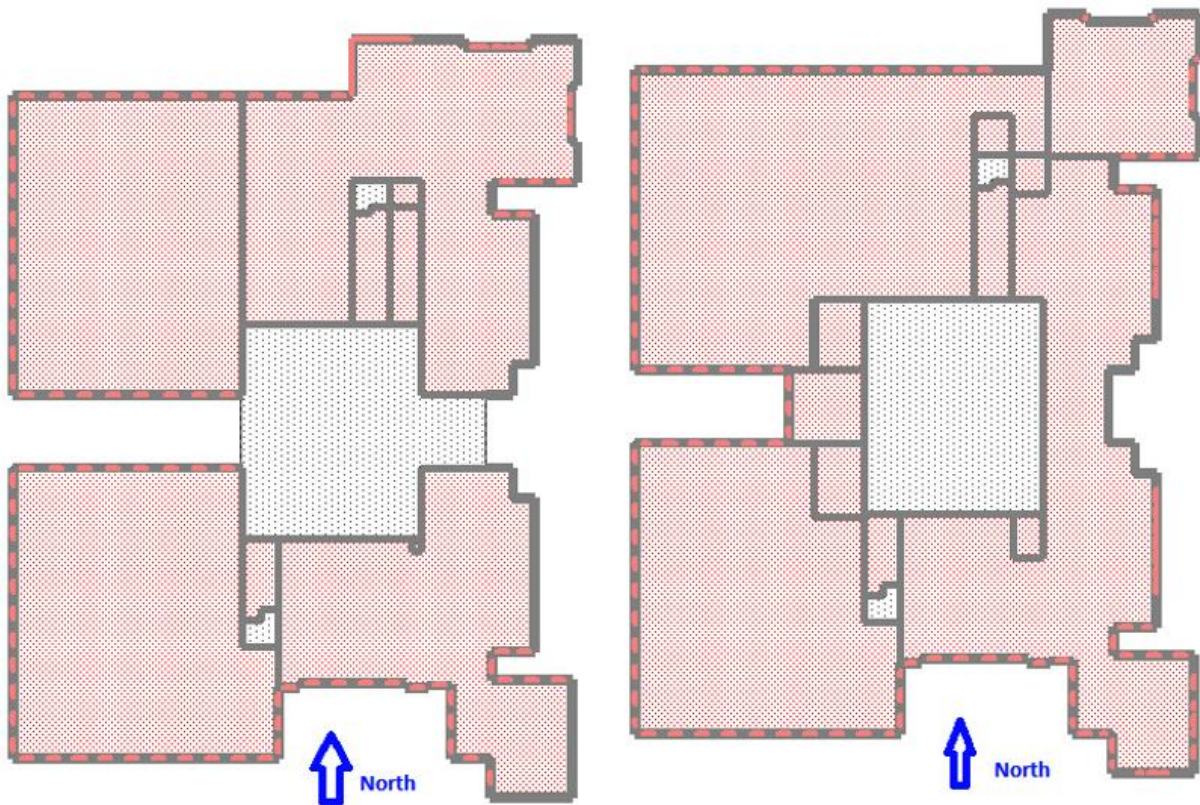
Ground Floor and First Floor plan (eQUEST)
